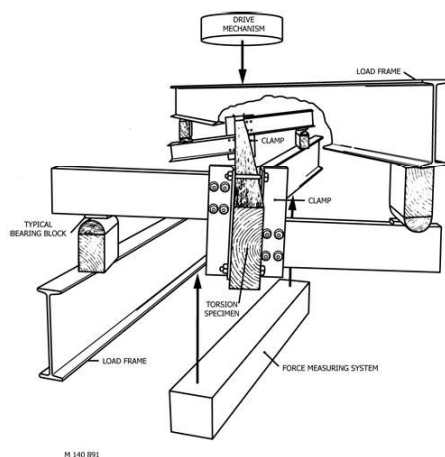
Schematic Diagram of a Torsion Test Made in a Universal-Type Test Machine
